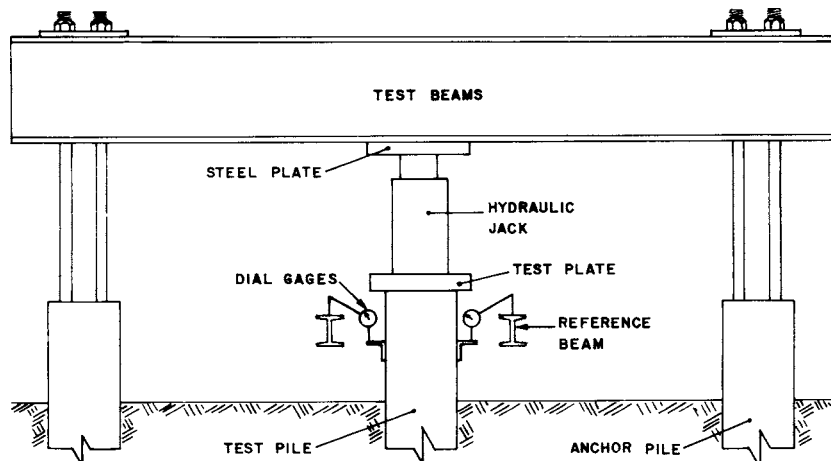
Schematic Setup for Applying Loads to Pile Using Hydraulic Jack Acting Against Anchored Reaction Frame
